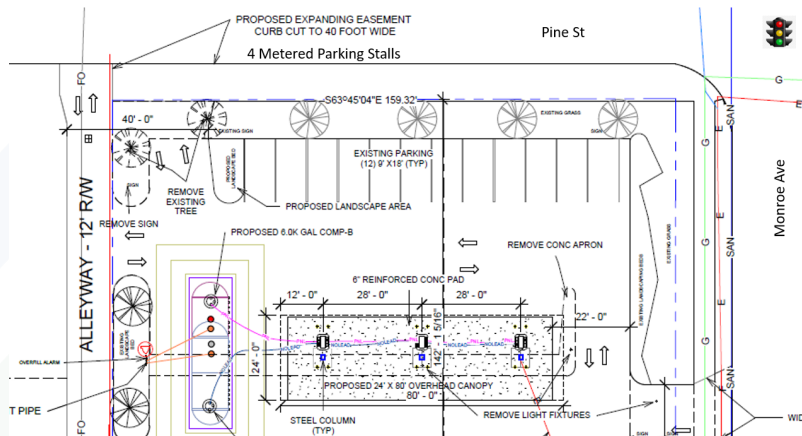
Proposed Driveway, Monroe Ave, 201 N Monroe Ave Redevelopment
